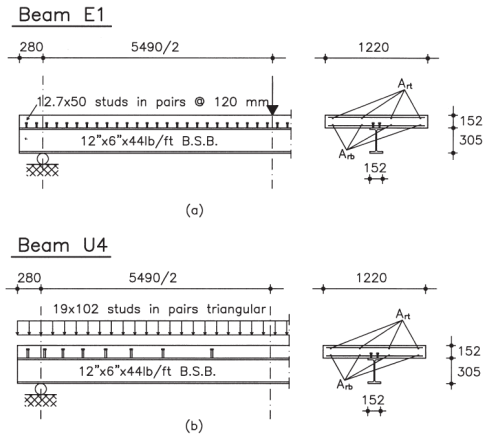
Geometrical properties of simply supported beams (adapted from [22, 5]).
